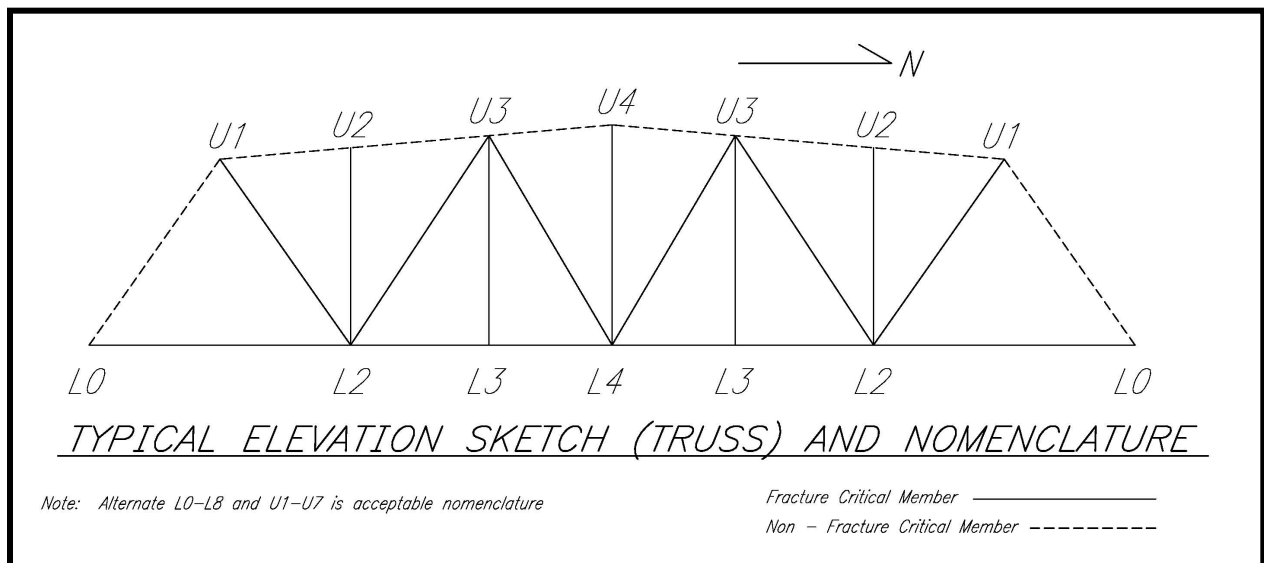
4-4: Example Inspection Plan Sketch (Truss)
